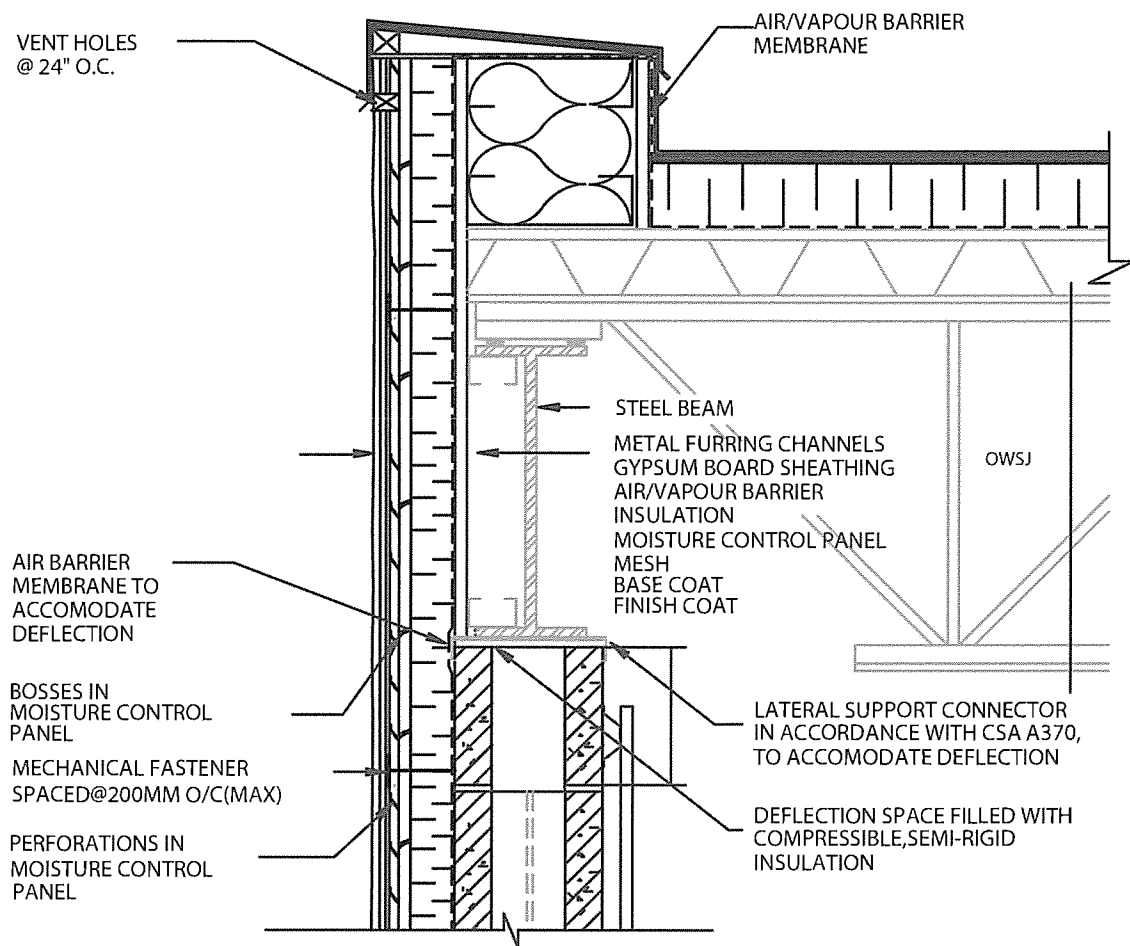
ACRYLIC STUCCO / CONCRETE BLOCK
